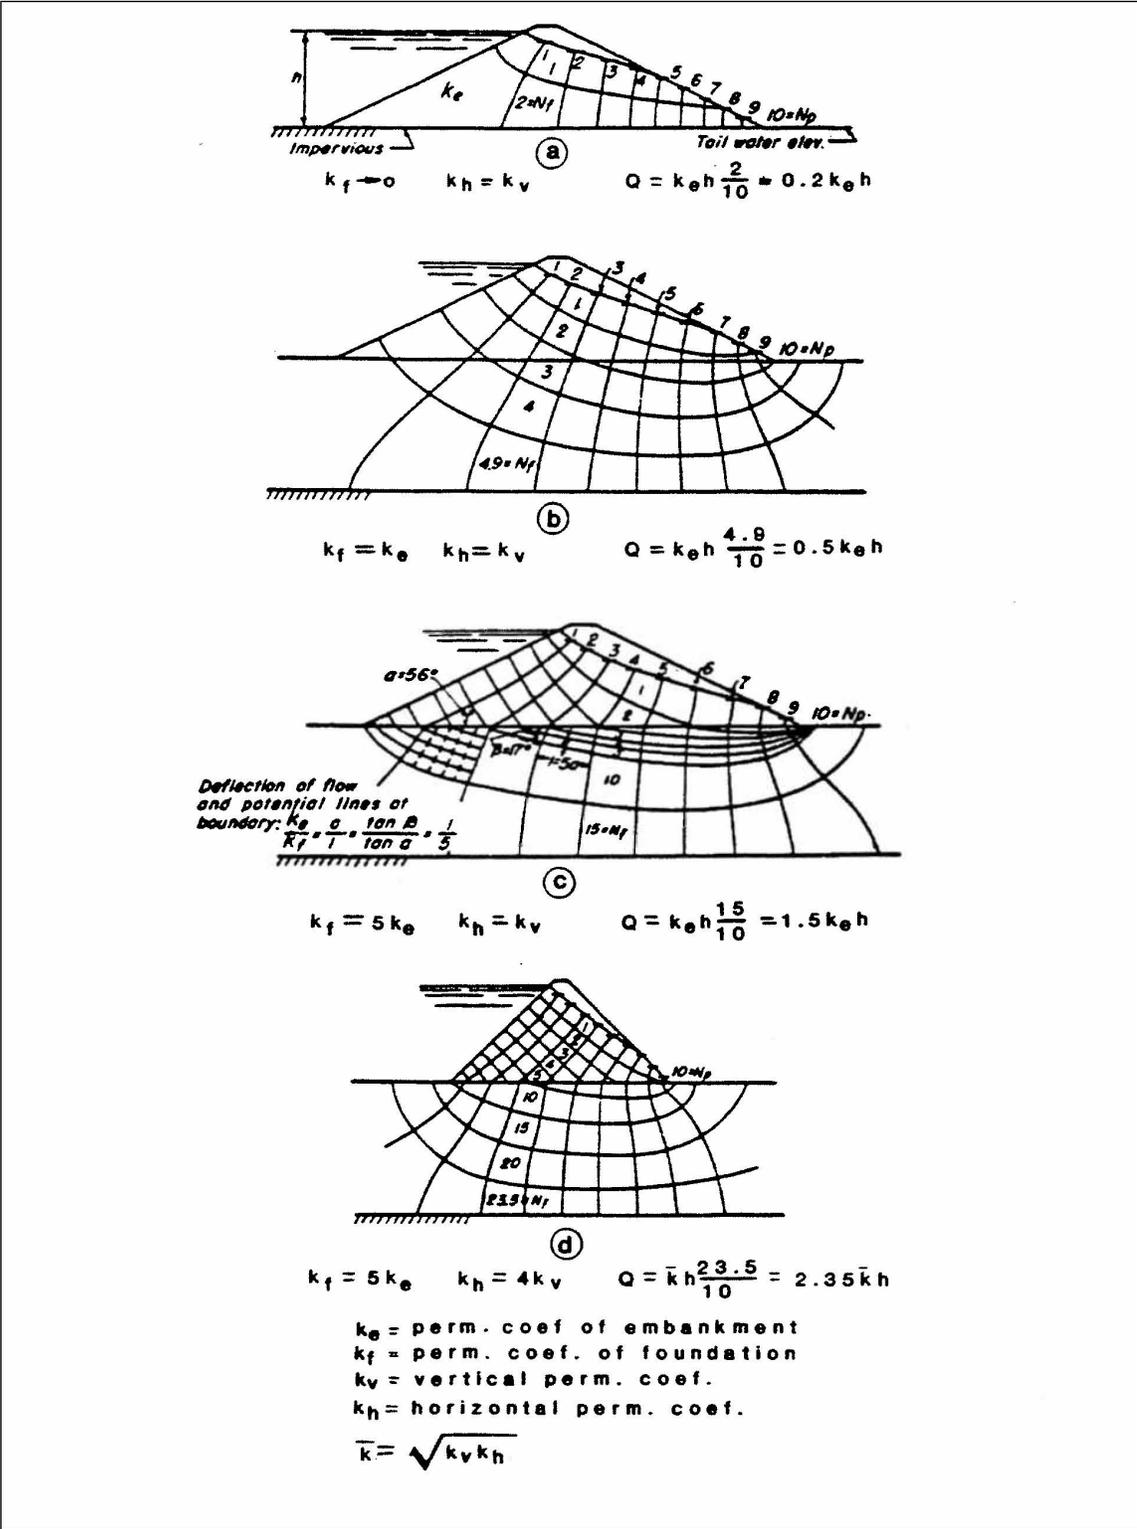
Seepage through embankment and foundation [17a].
